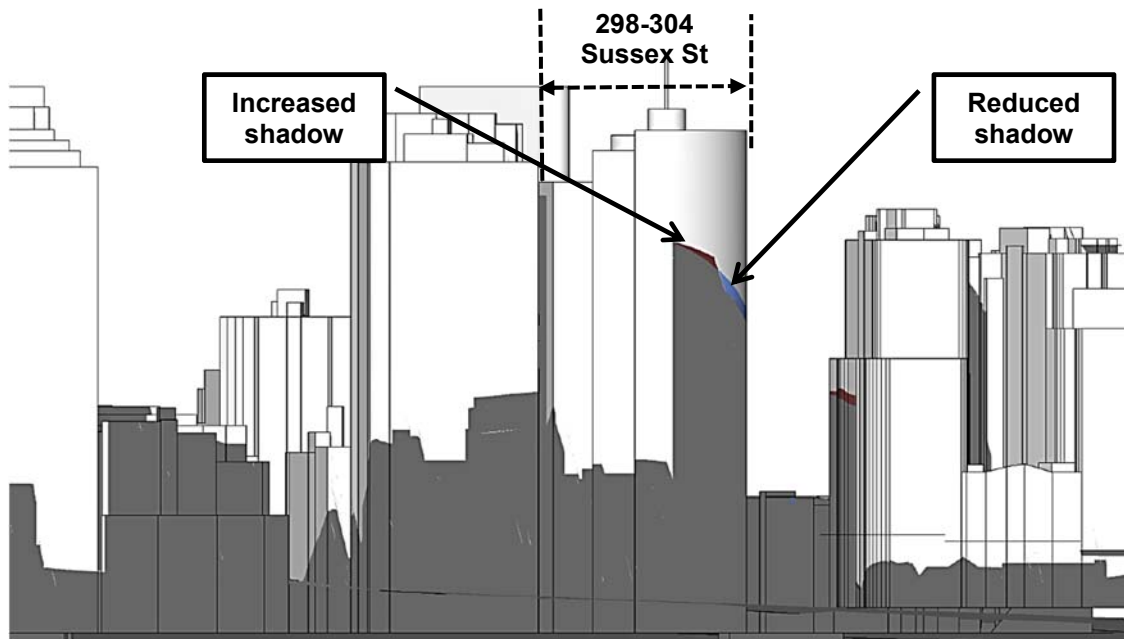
Diagram in elevation showing shadowing of the residential tower at 298-304 Sussex Street at 11am on 21 June.
